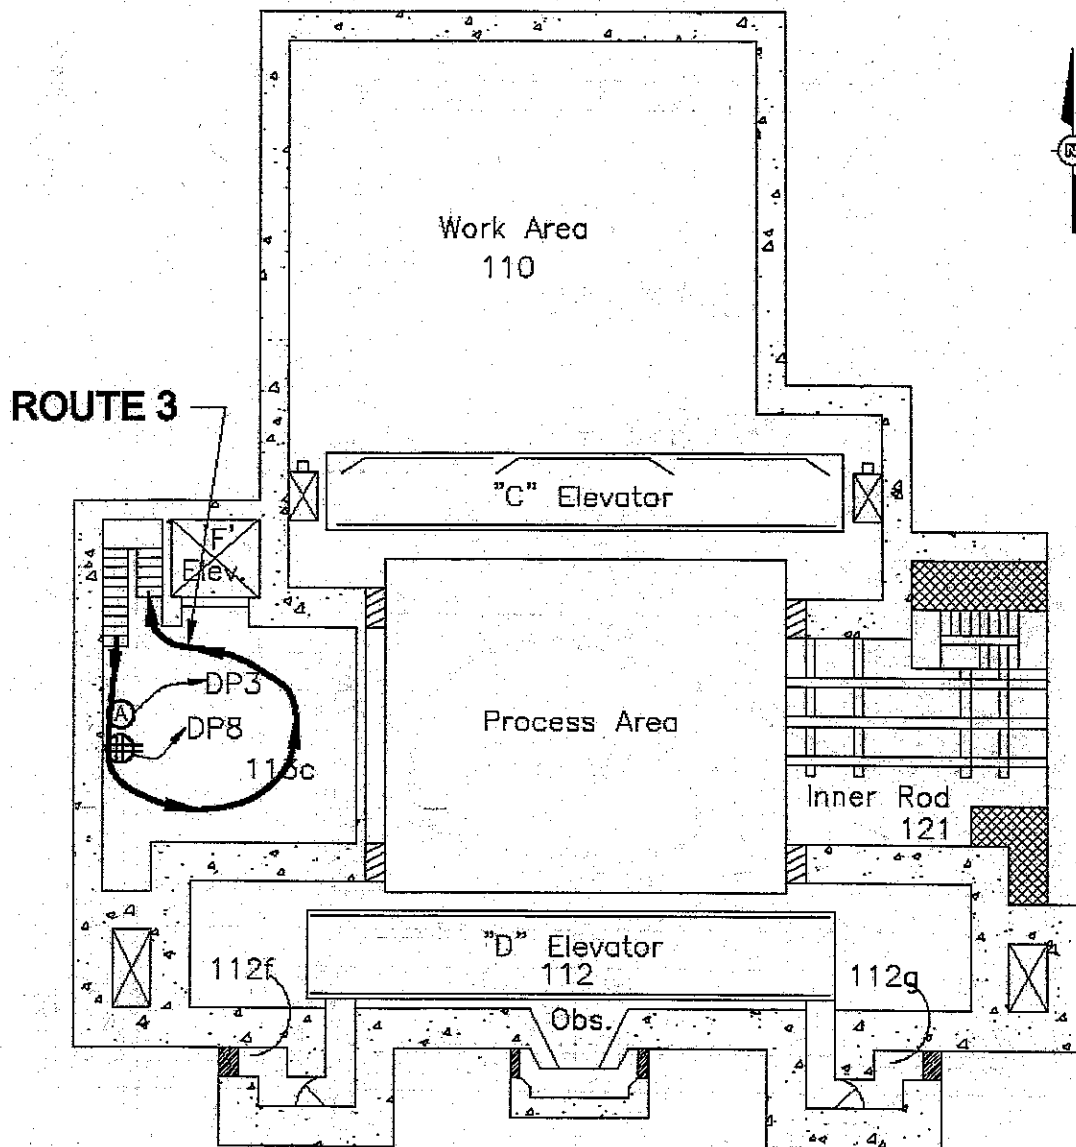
Surveillance and Inspection Route (Elevation 12 ft 0 in.).
